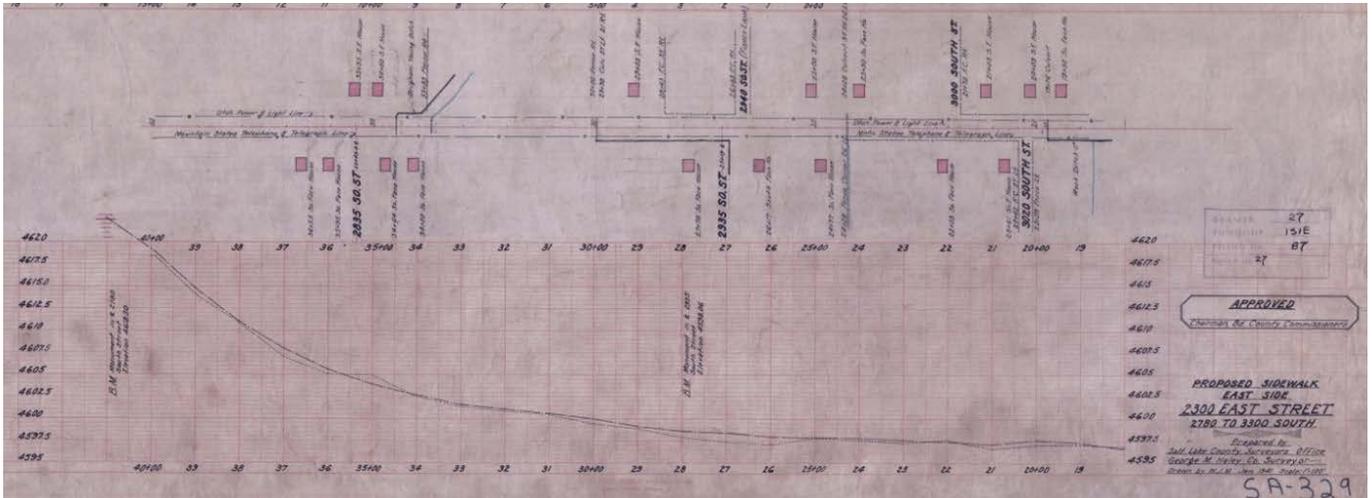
Proposed Sidewalk Plan for 2300 East, 1941
